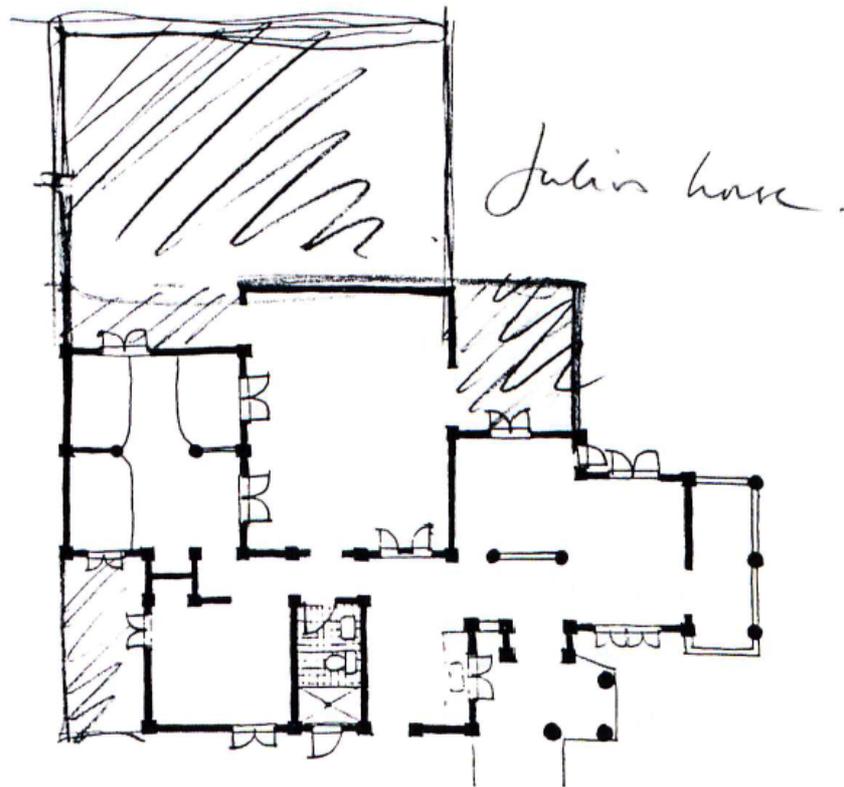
Sketch of the floor plan of José's house in Mexicali.
